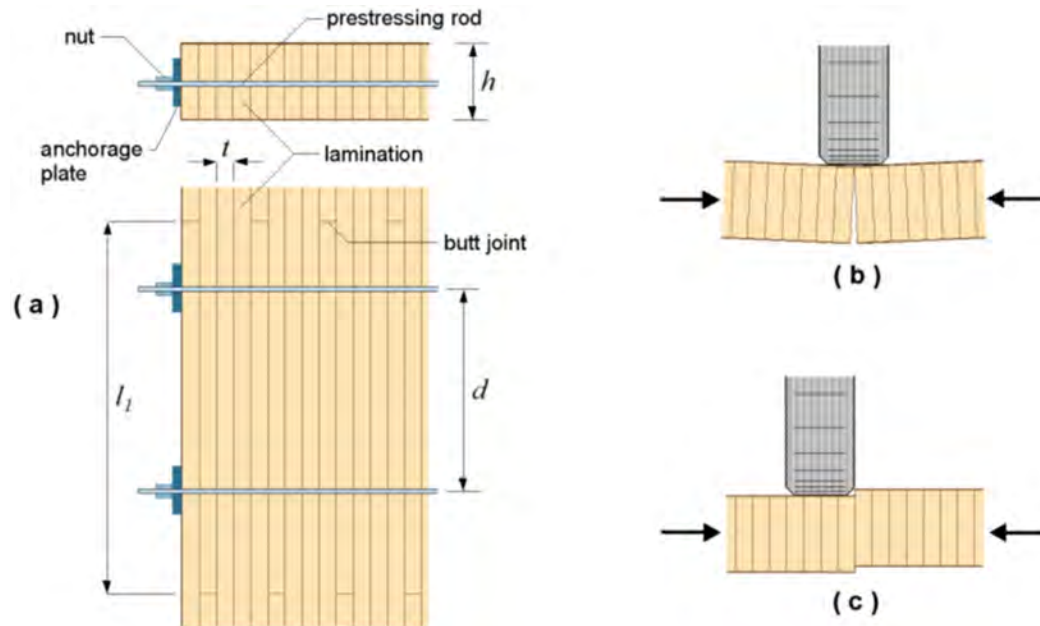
Stress-laminated timber deck plate (drawing: K. Bell)
